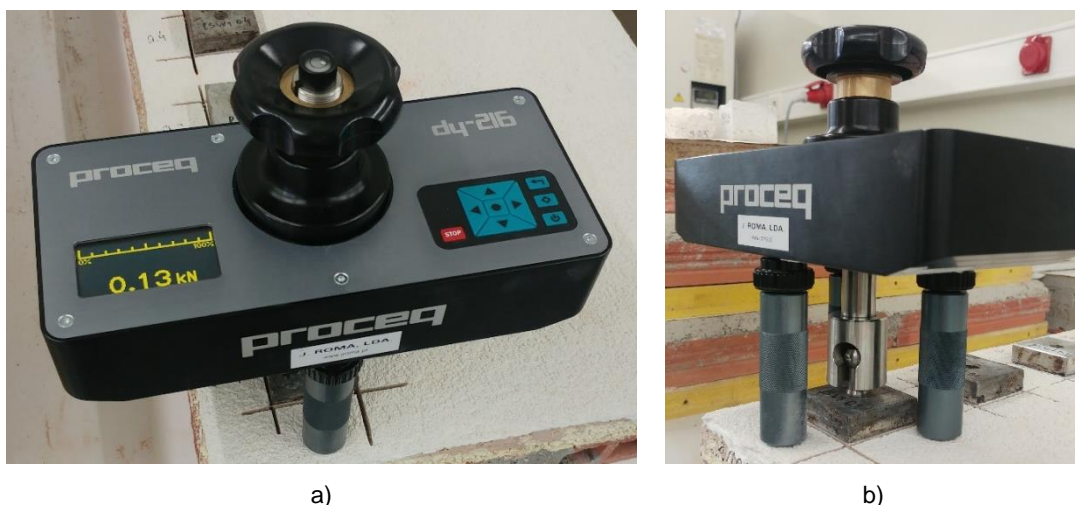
a) Testing machine Proceq DY-216; b) Testing machine attached to the glued pull-head.
